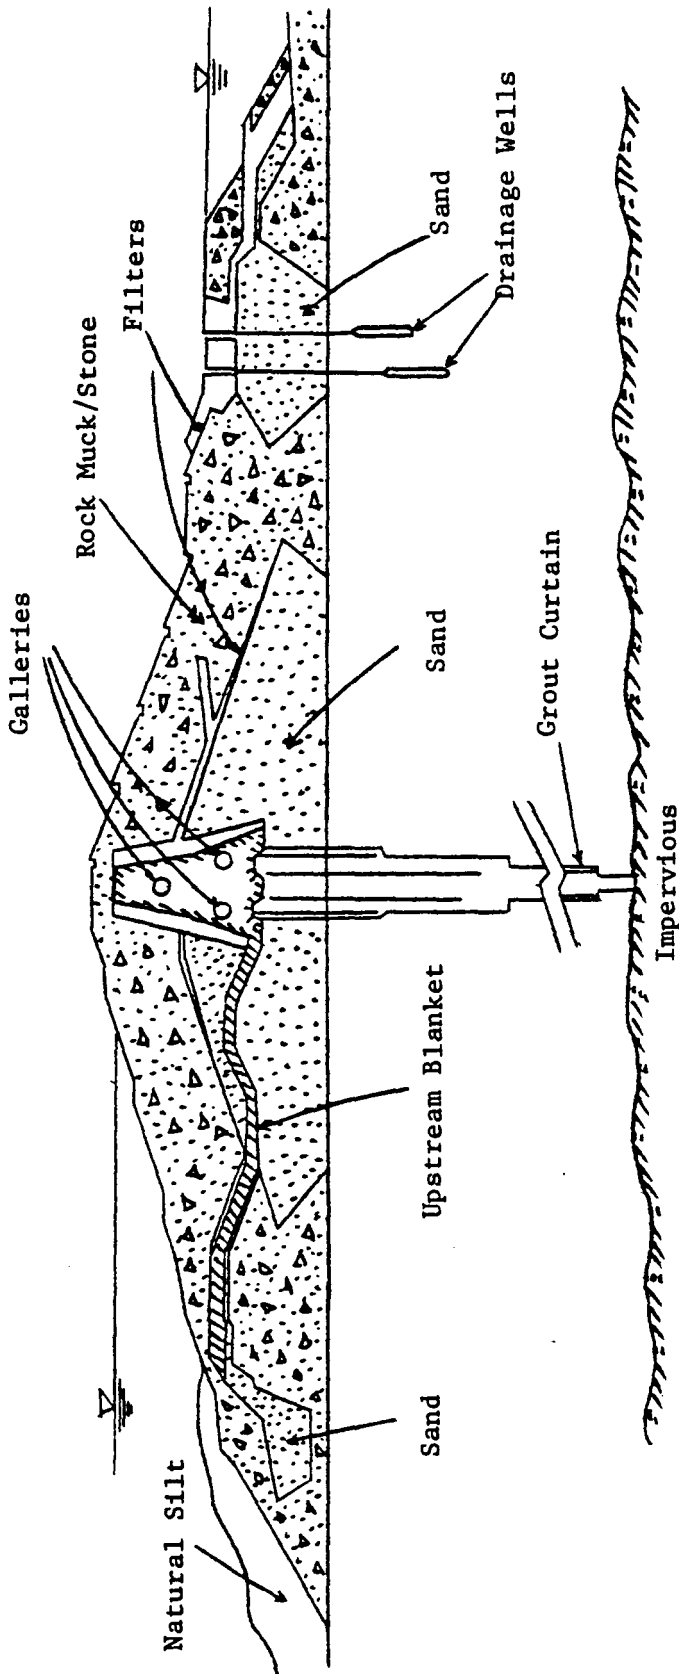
Schematic cross section of High Aswan Dam, Egypt [Ref. 8].
